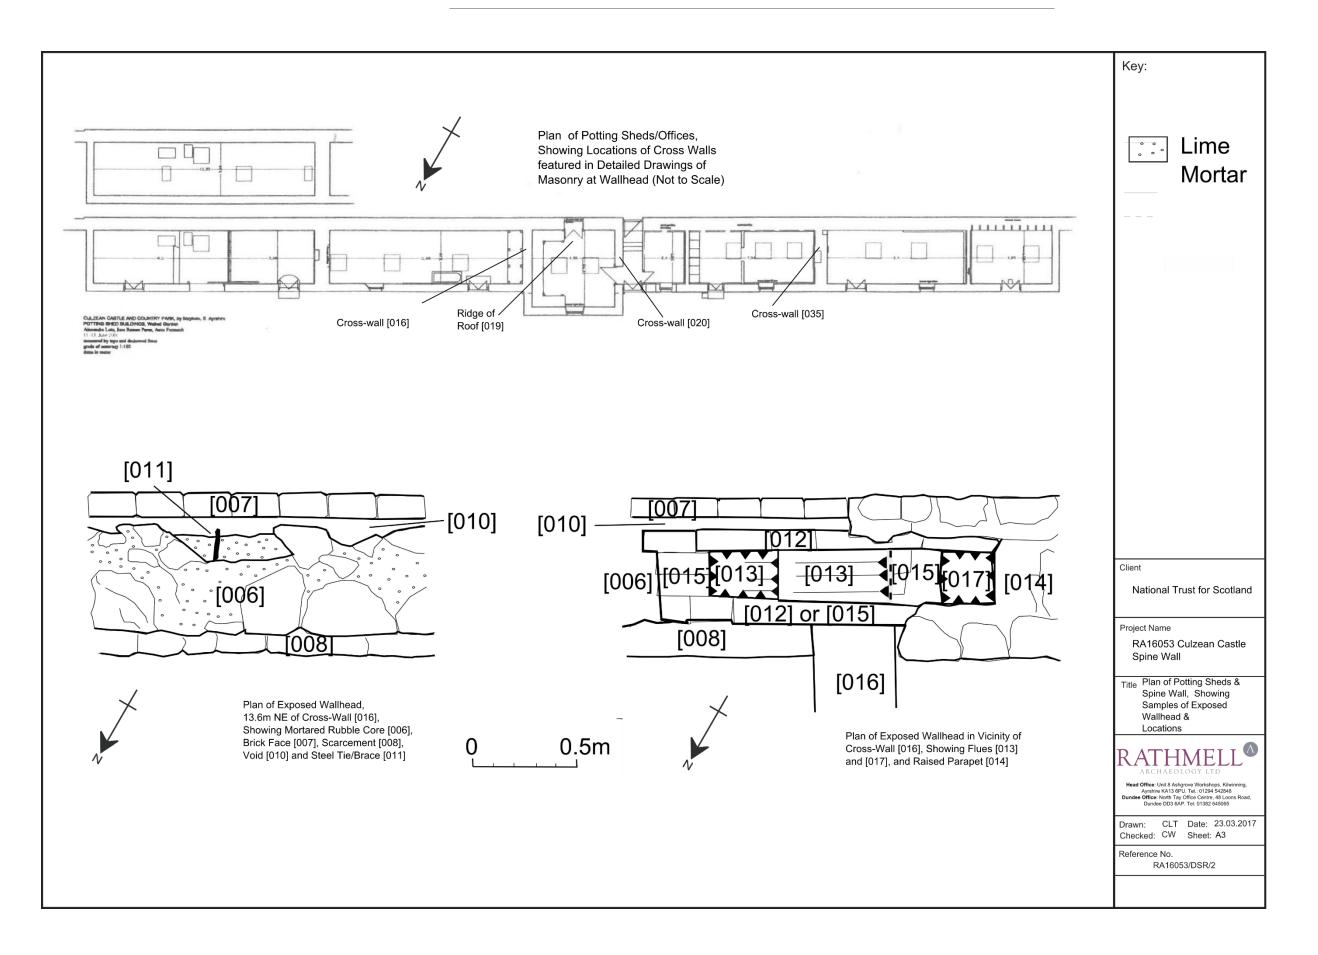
Plan of potting sheds and spine wall, showing samples of exposed wallhead and locations
